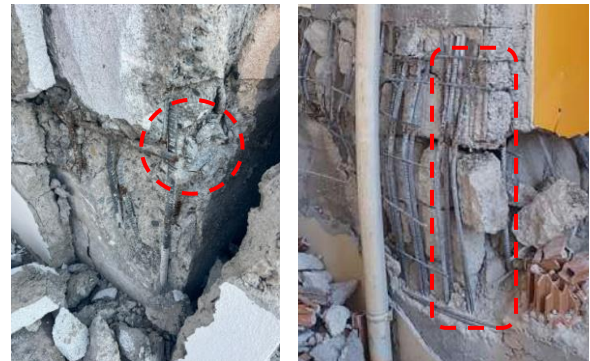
Rupture in stirrup and buckling of longitudinal reinforcement
